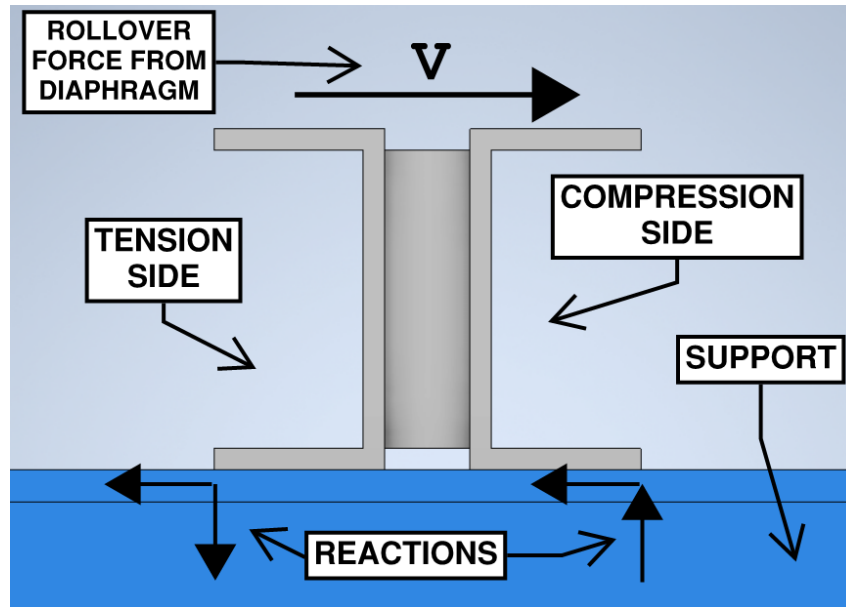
Generic Joist Subjected to a Rollover Force
